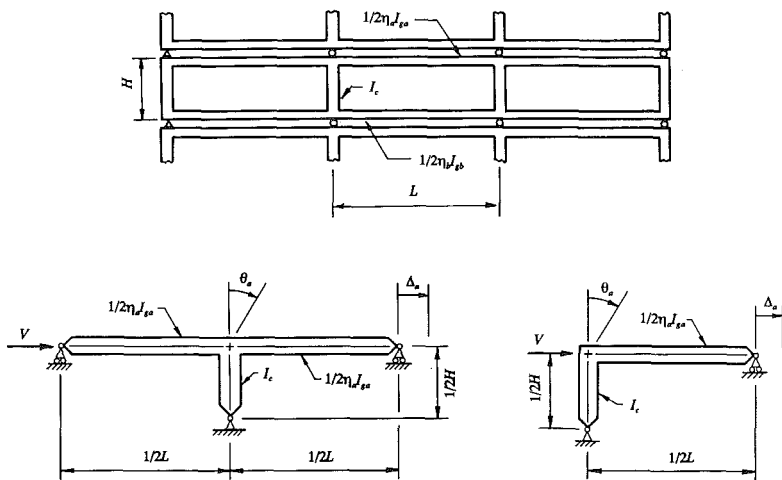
Idealization of Story: (a) Isolated Story; (b) Interior Girder-Column Assemblage; (c) Exterior Girder-Column Assemblage
